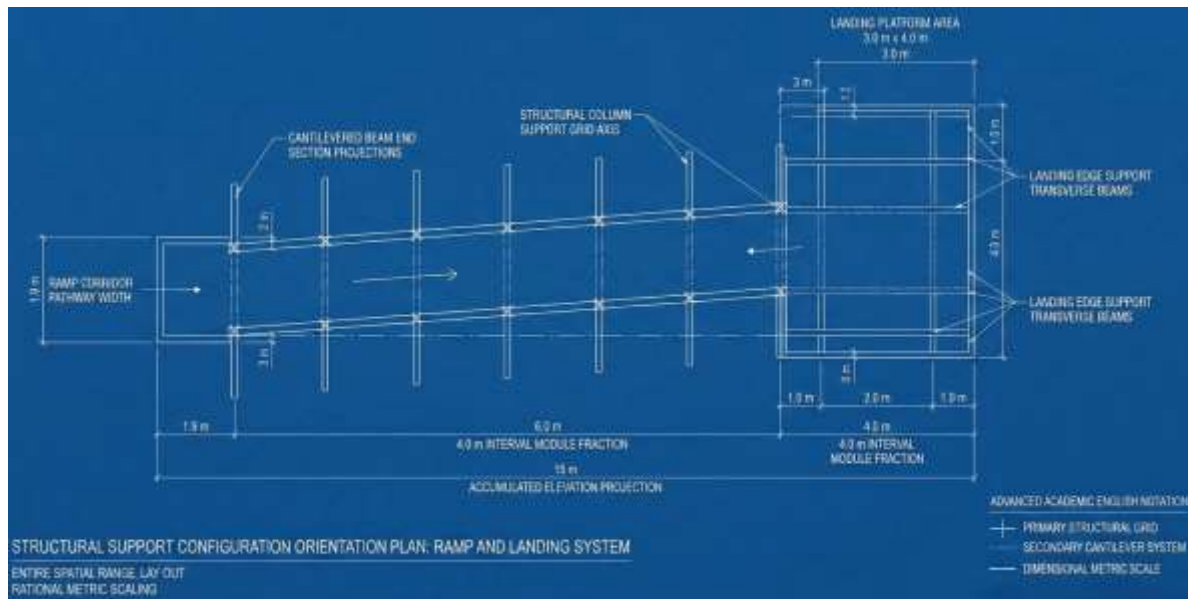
Layout Plan of Continuous Slab Ramp Structure Intersecting with Landing Platform
